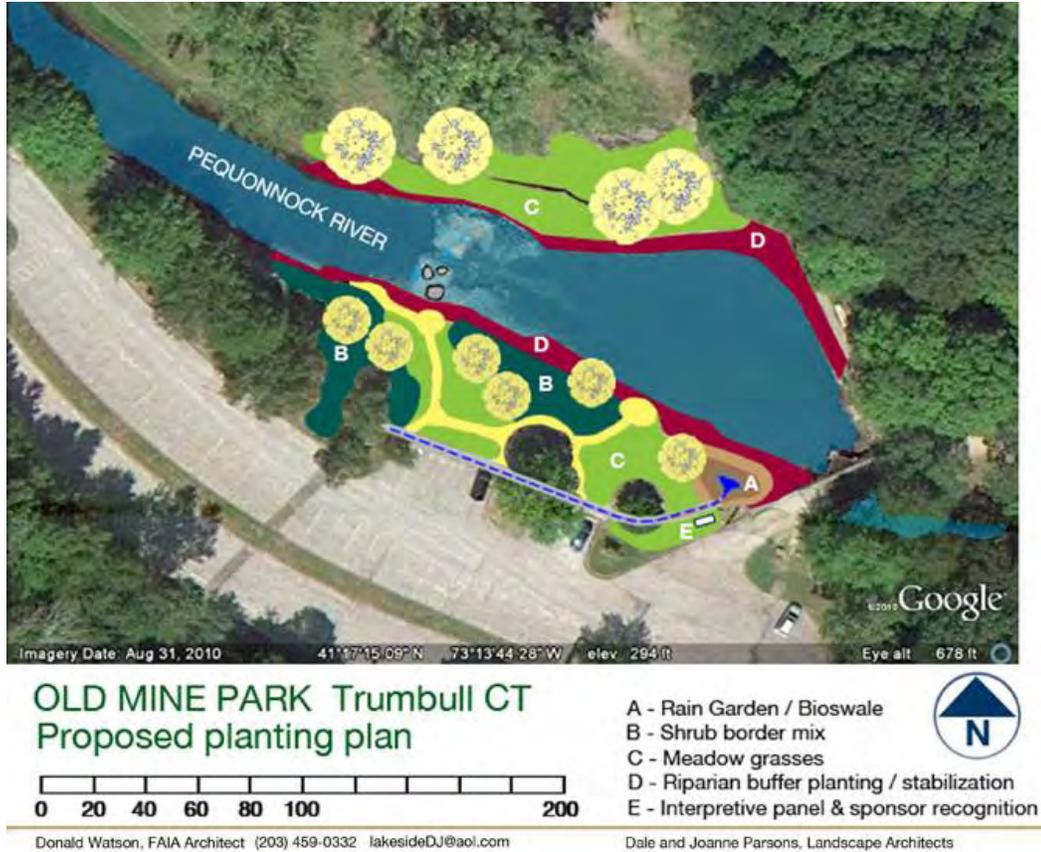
Old Mine Park Restoration Concept Site Plan
